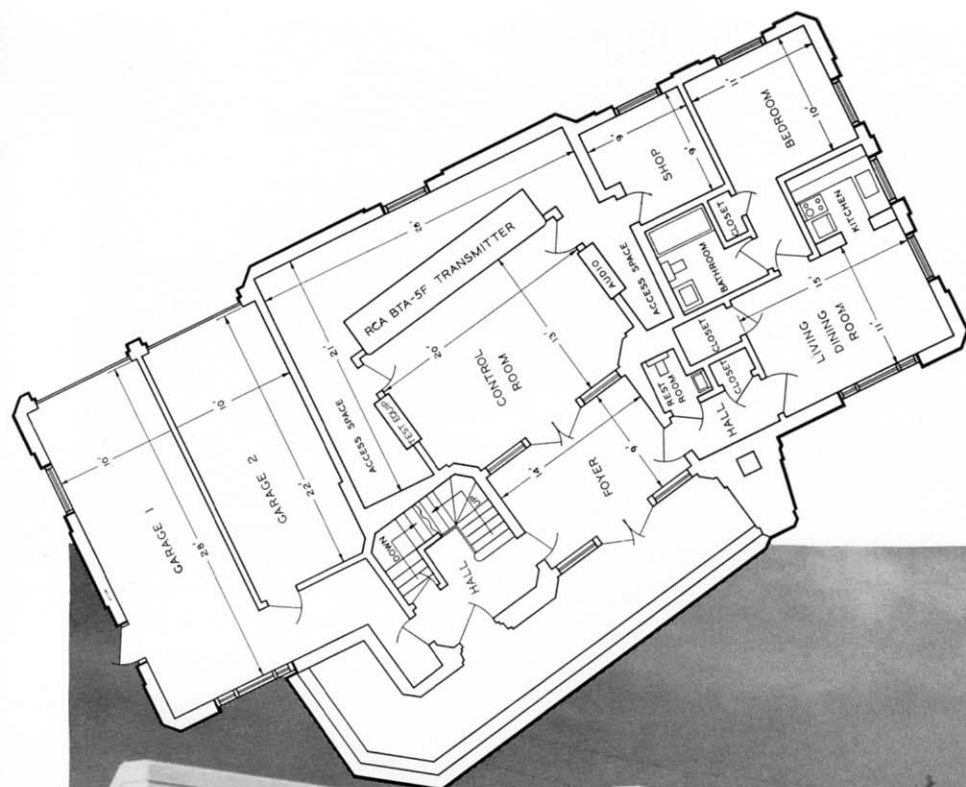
The modernistic KENI transmitter building is constructed of reinforced concrete. Inset at upper left shows layout of garage, transmitter and bachelor apartment facilities on the main floor of the building.
